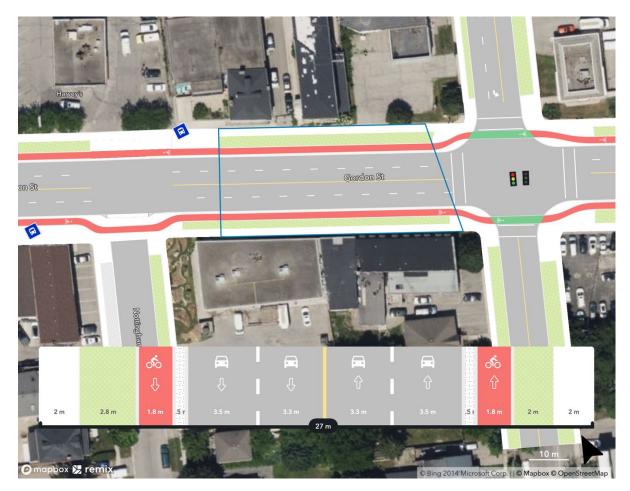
Design Option 3 Example between Wellington Street West and Waterloo Avenue
